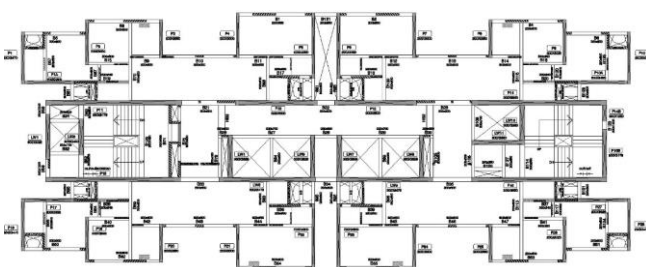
Framing Plan layout with Shear wall & Beam Sizes
